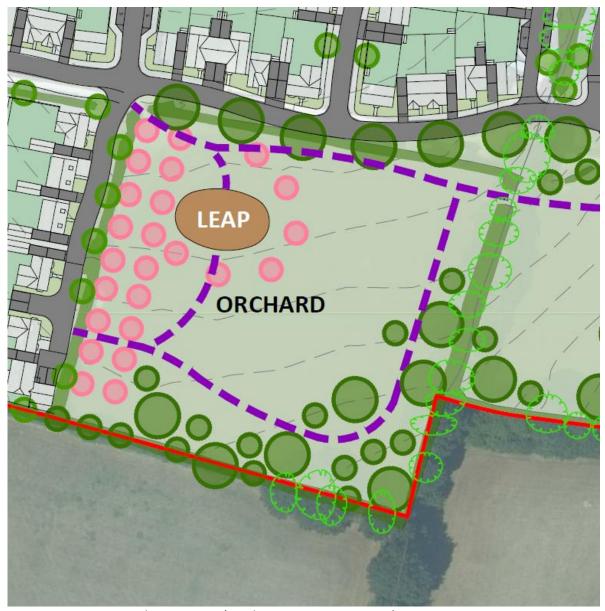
Central greenspace (Landscape strategy CD 1.61)
